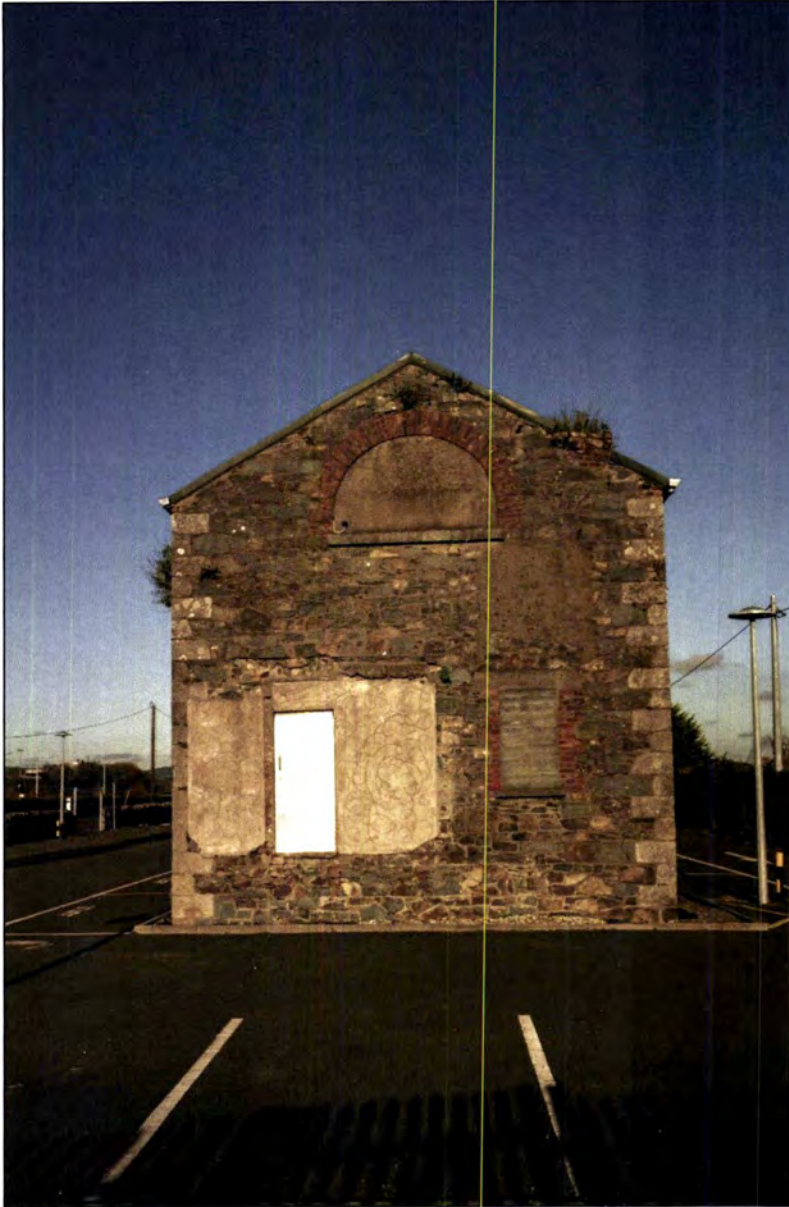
South facing elevation of Goods building located in carpark east of station, note chimney at top right.
